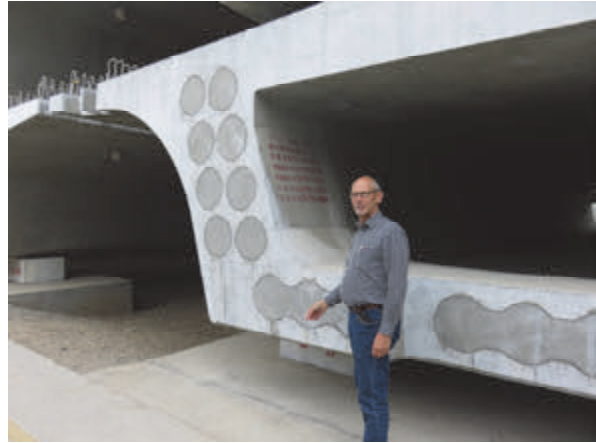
Precast concrete bridge decks (with L. Boehme)
